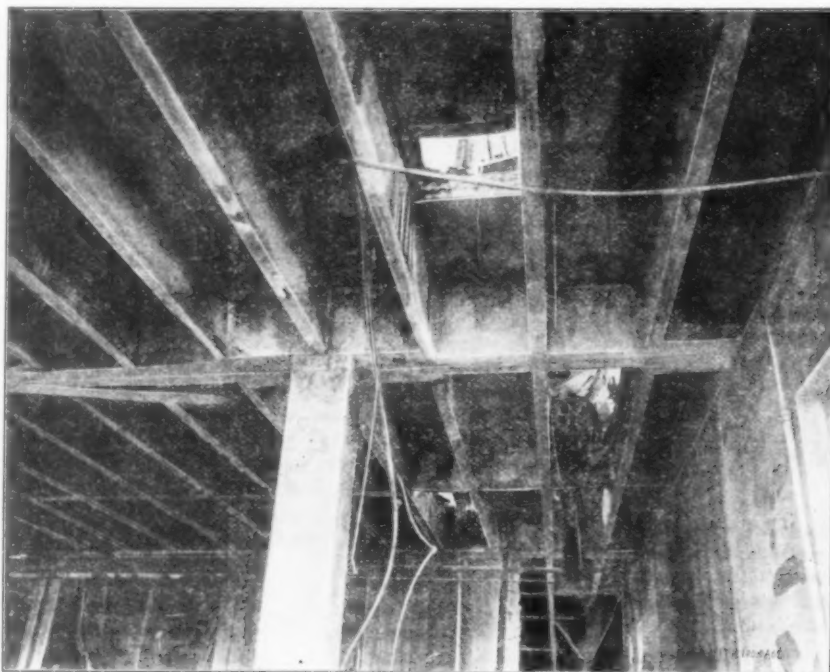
SHOWING SLIGHT EFFECTS OF FIRE ON CONCRETE CONSTRUCTION.
